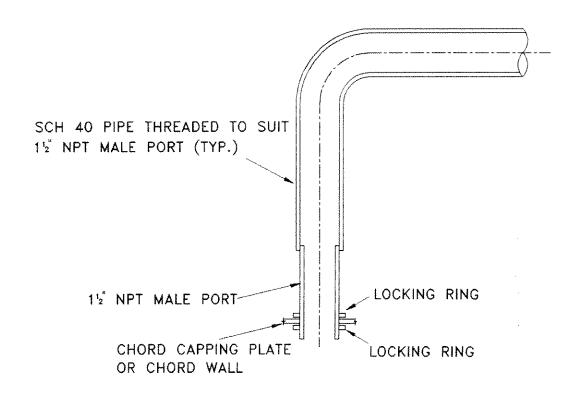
ARRANGEMENT OF CHORD GROUT OUTLET.
